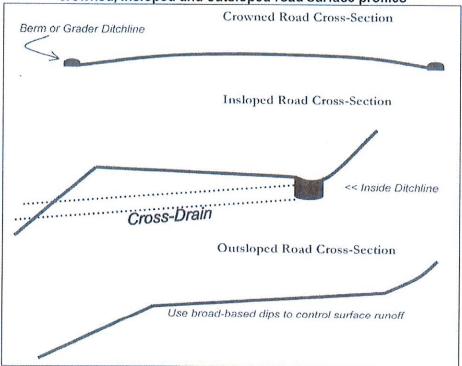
I: Schematic cross-sectional sketch of crowned, insloped and outsloped road surface profiles
